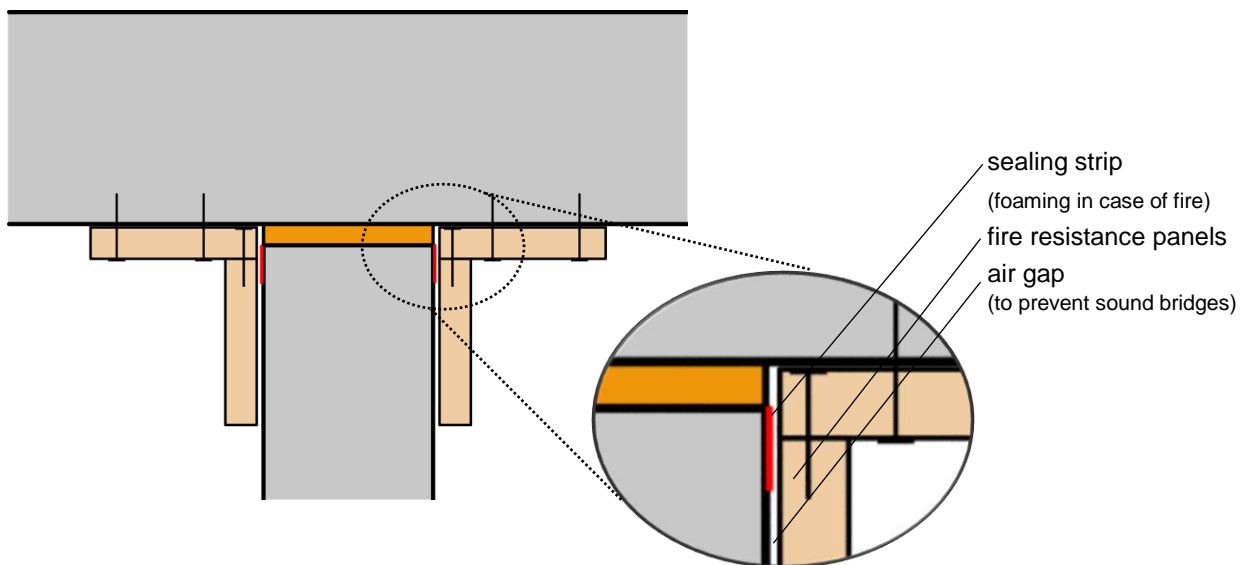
Covering of a point- or strip bearing with fire resistant panels (connection of column or wall to ceiling)
